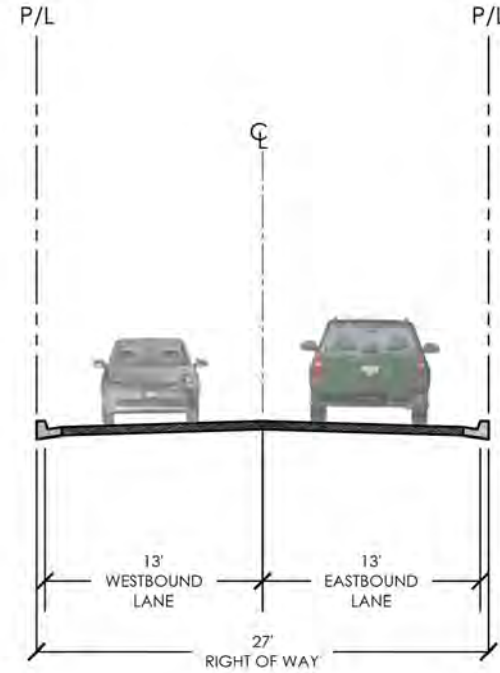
Alternative Road Network – Private Driveways X and Z
